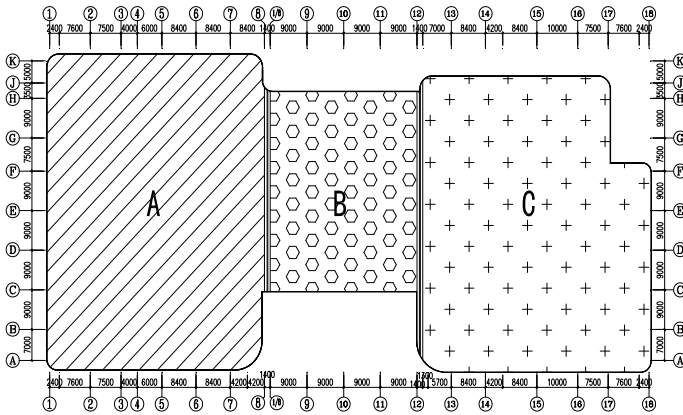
Schematic diagram of building layout (Unit A, B and C)
